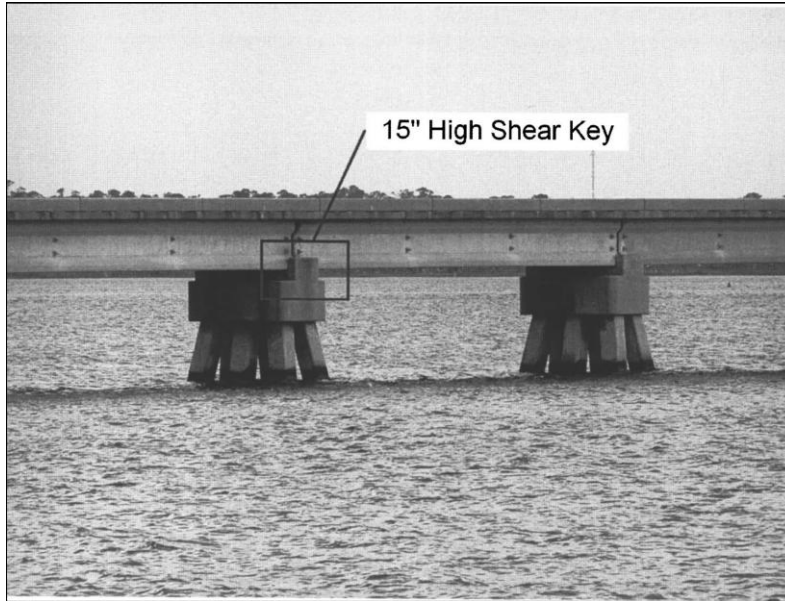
Railroad Bridge over Biloxi Bay with close-spaced girders and large concrete shear keys (Gilberto et al., 2007).
